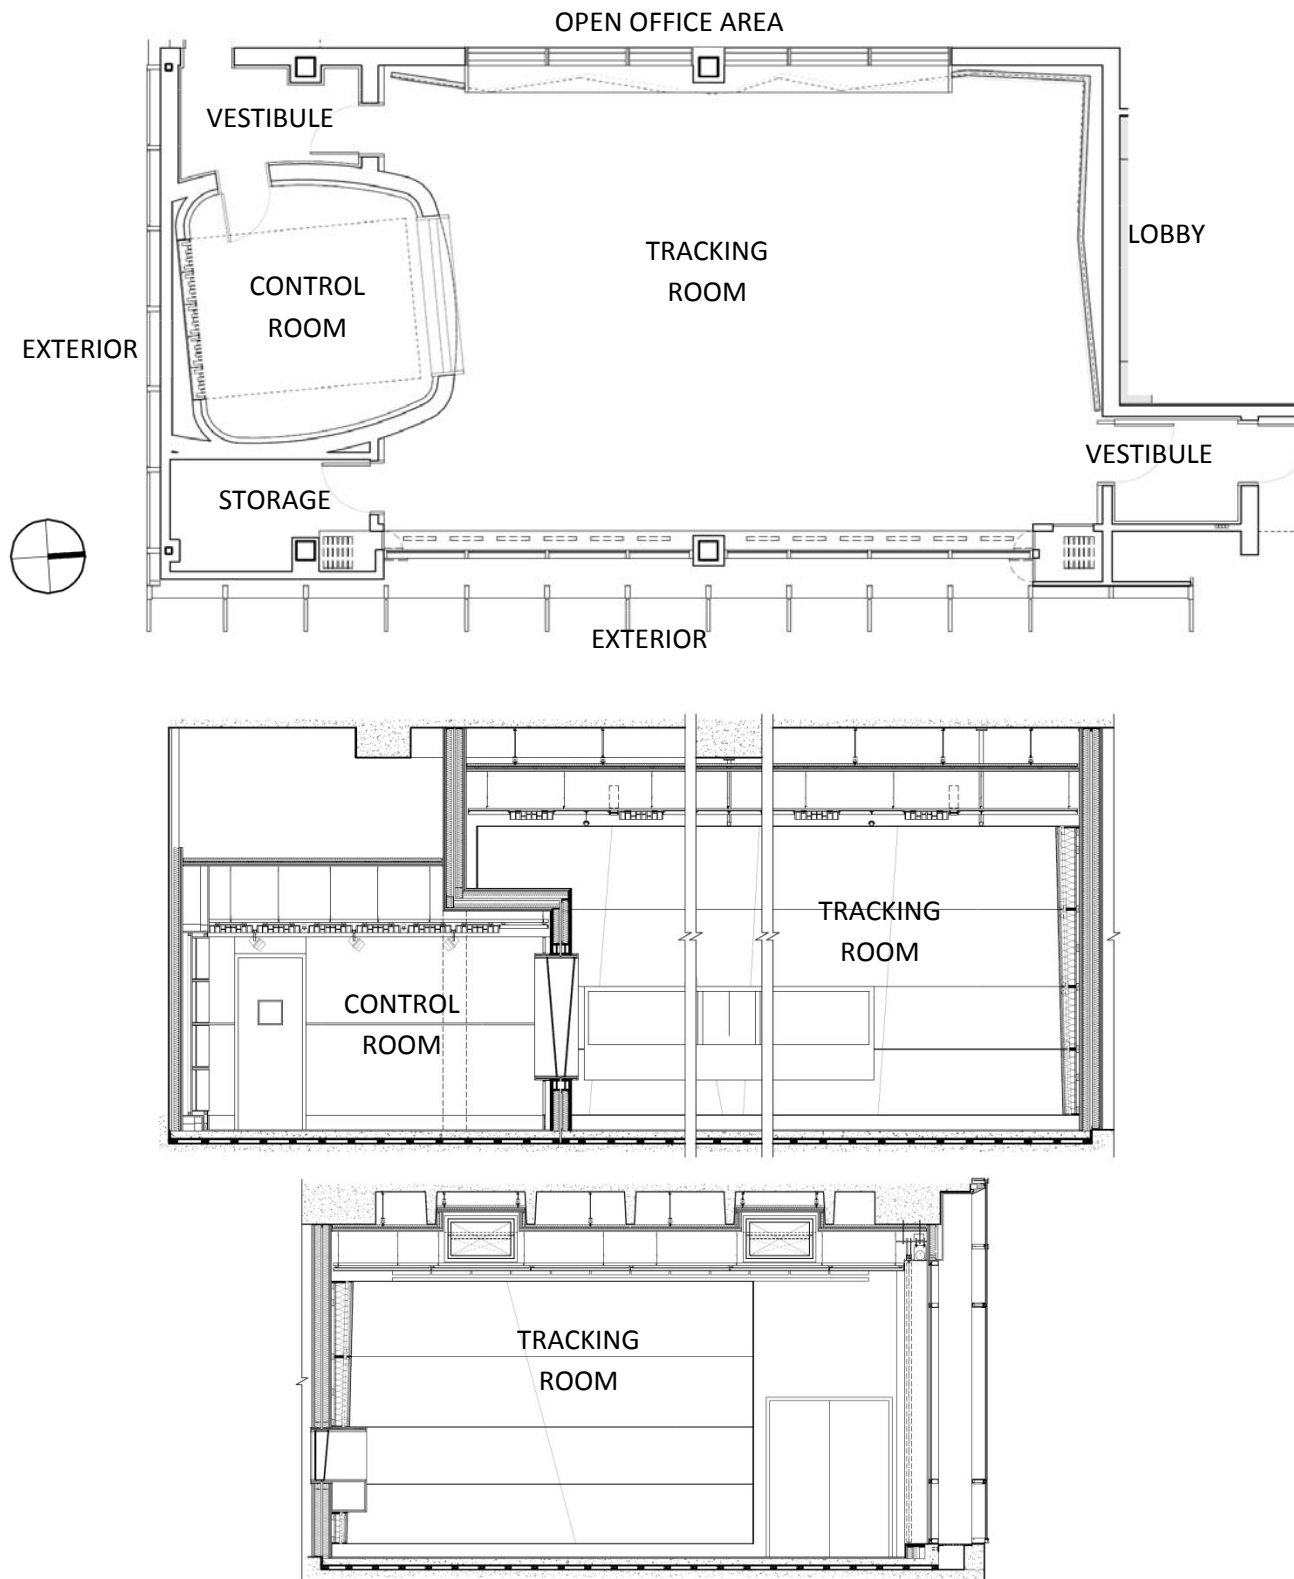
Plan and section views of Studio 1A – Note the irregularly shaped walls, and the thickness of wall assemblies surrounding the Studio Suite. Section views face west and north.
